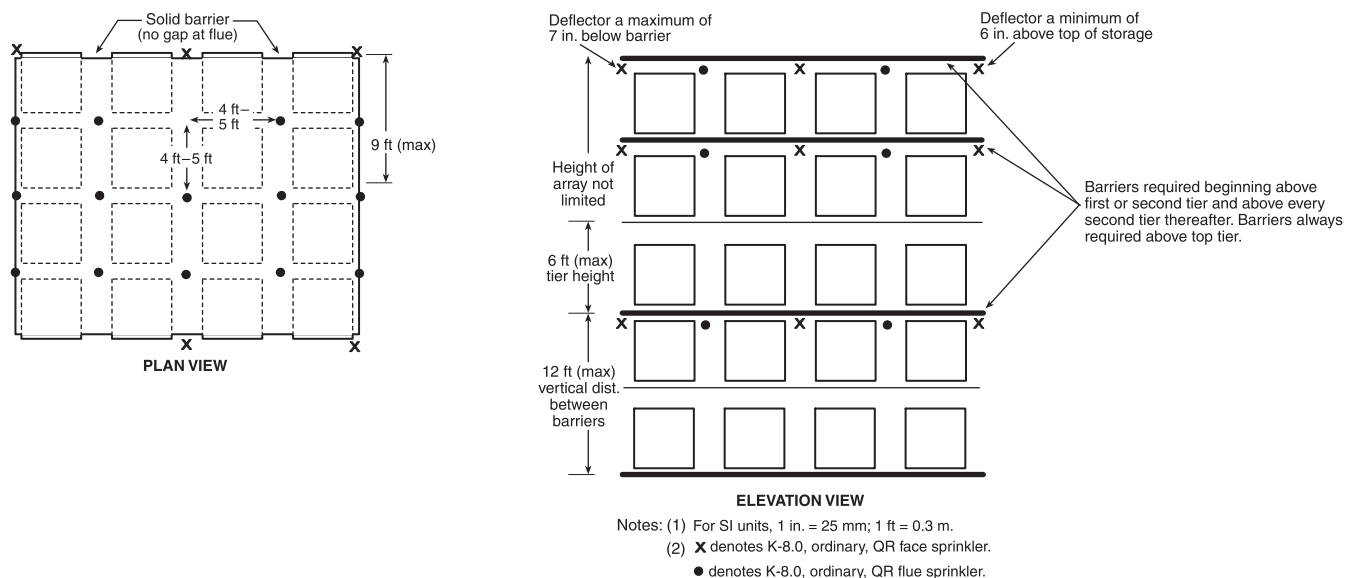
(c) Multiple-Row Rack Sprinkler Layout for Design Scheme “C.”
